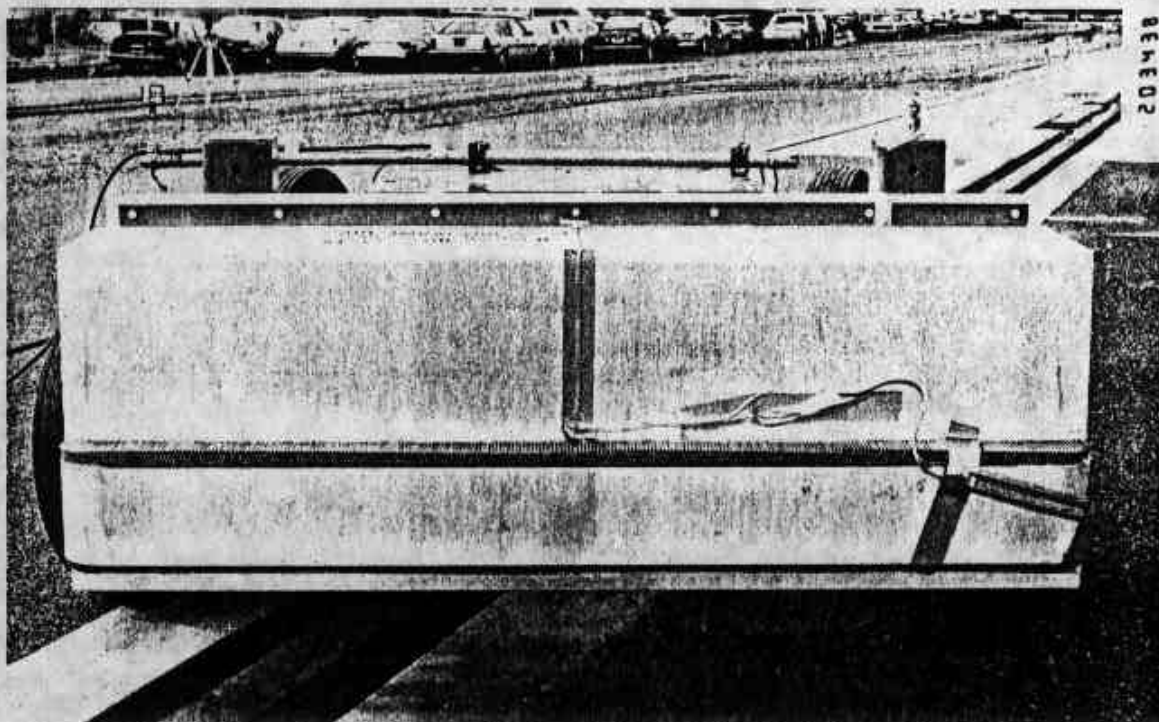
PRE-TEST FRONTAL VIEW OF BARRIER FACE.
